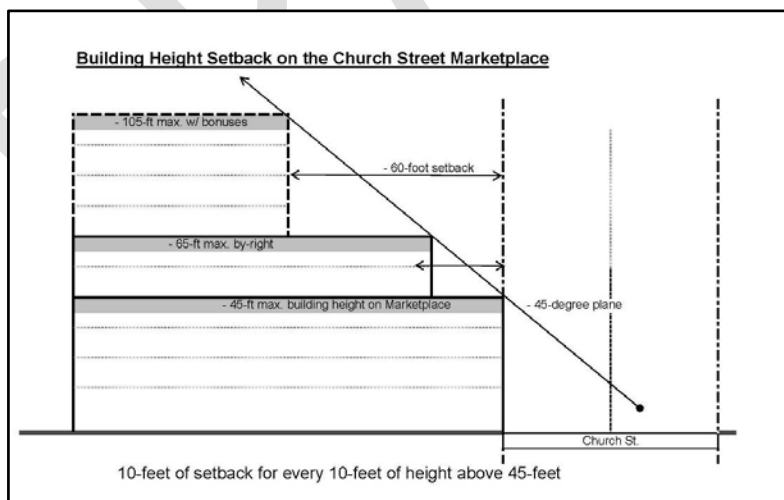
Measuring Height Limits for Church Street Buildings
